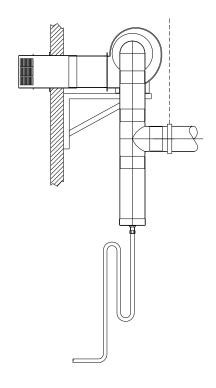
Stainless Steel Telescopic Through The Wall Arrangement (available for Type 'O' and Type '2' fans)
